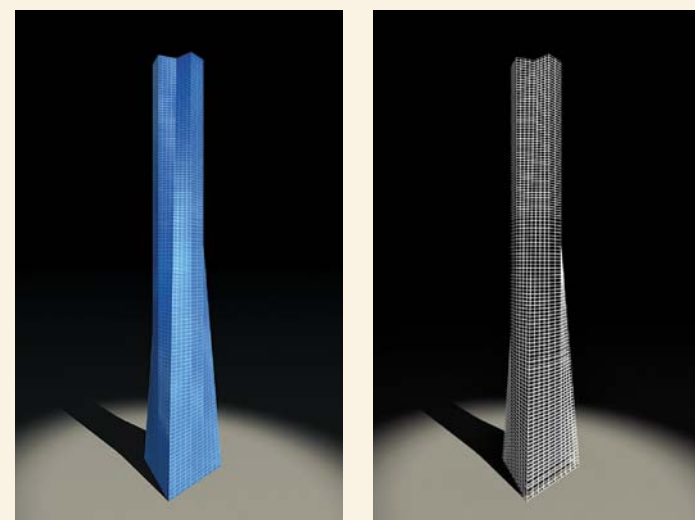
Architectural and Structural Renderings (03-34-b-m)
